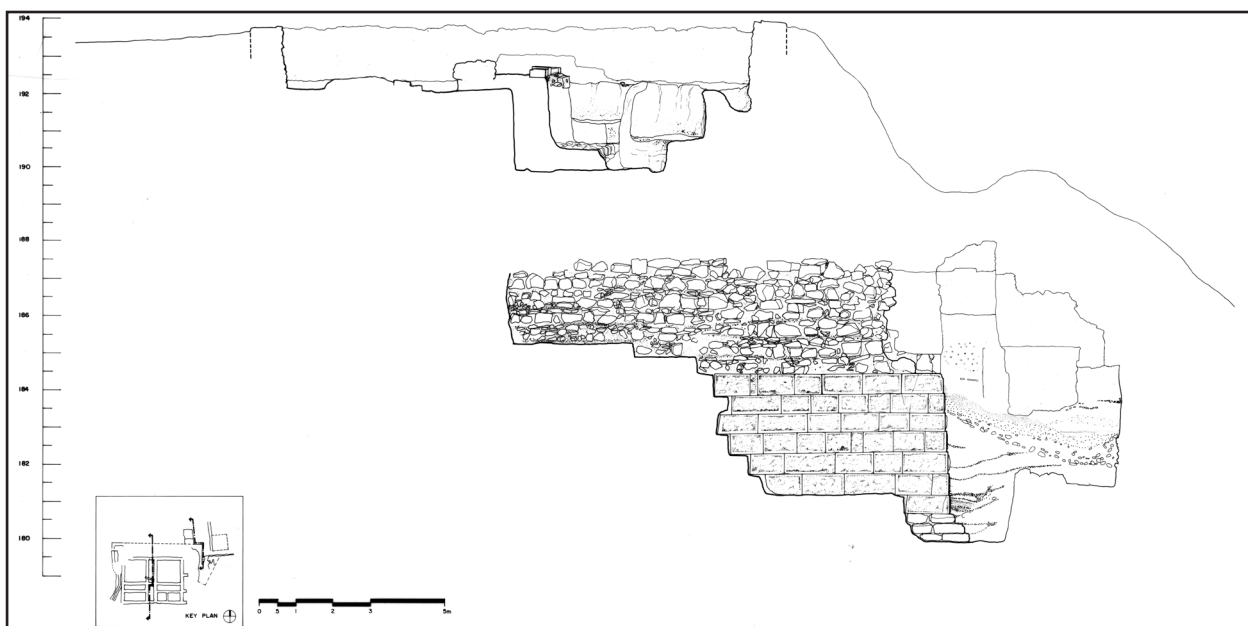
Elevation of eastern flank of ByzFort terrace, showing limestone terrace wall, boulder packing, and stylobate and "basement" on summit.
